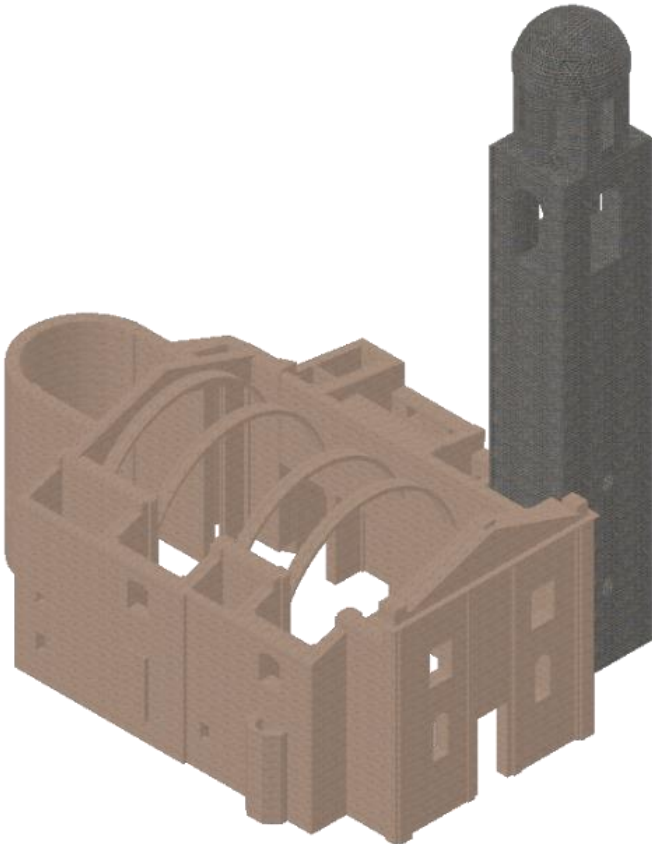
Architectonic Model, Structural Wall, Facade and Bell Tower
